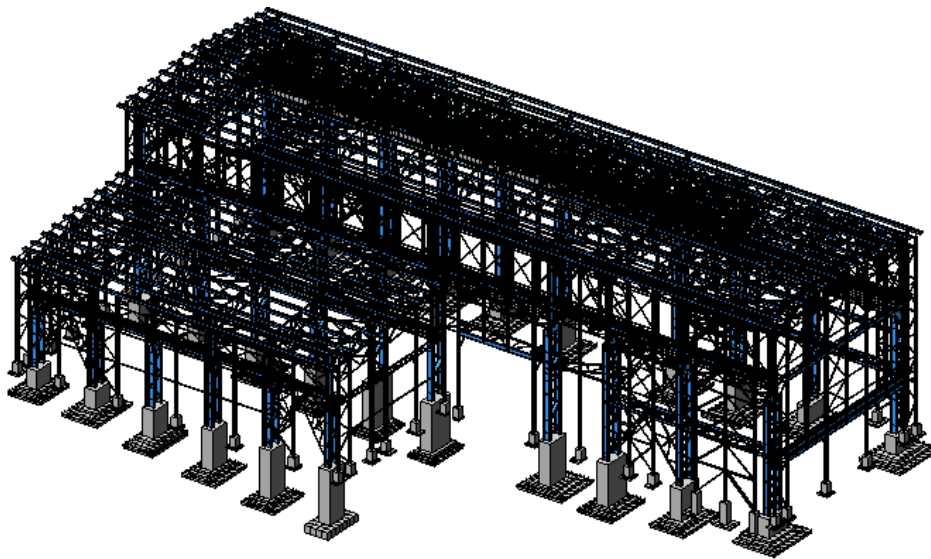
Computational model of building No. 4 of the continuous steel casting department
